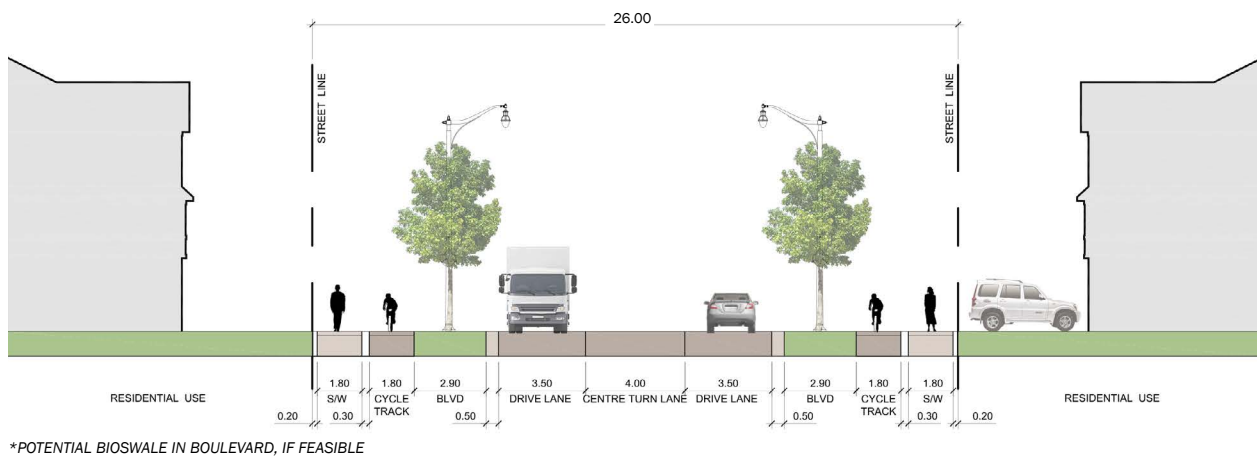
26.0m Collector Streets “A” & “B” Cross Section through Compact Residential Area.
